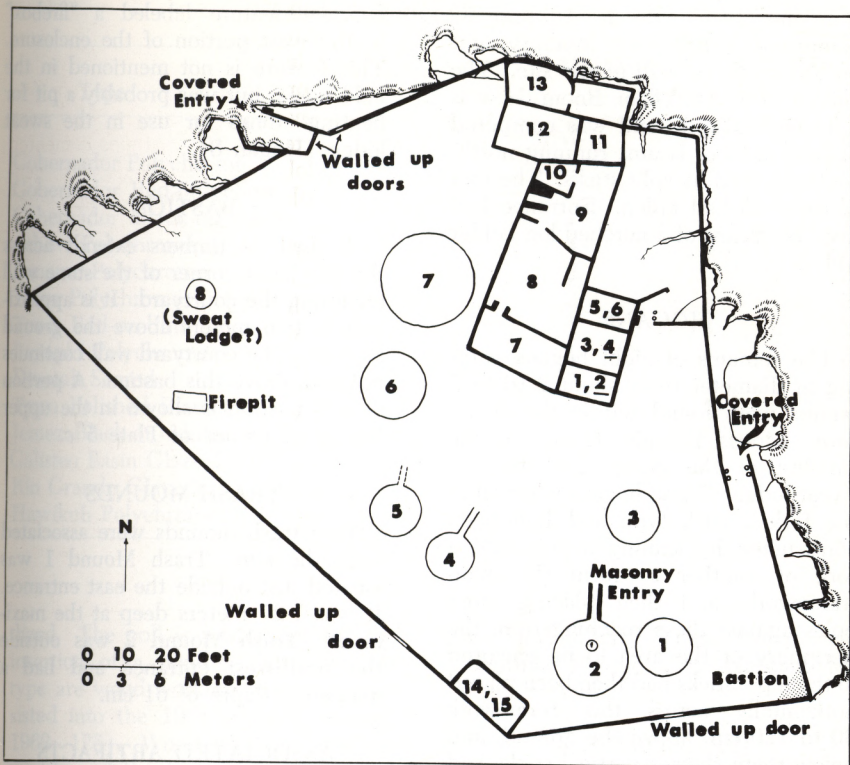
Plan view of compound wall, hogans, and ground floor masonry rooms at Site 3. Underlined numbers refer to second story rooms not shown on plan.
